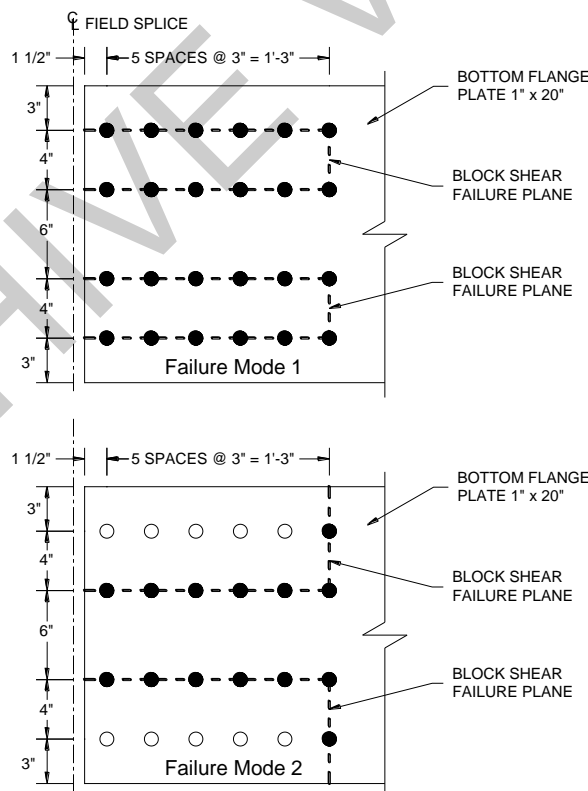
Bottom Flange Splice – Assumed Block Shear Failure Planes in the Flange on the Right-Hand Side of the Splice
